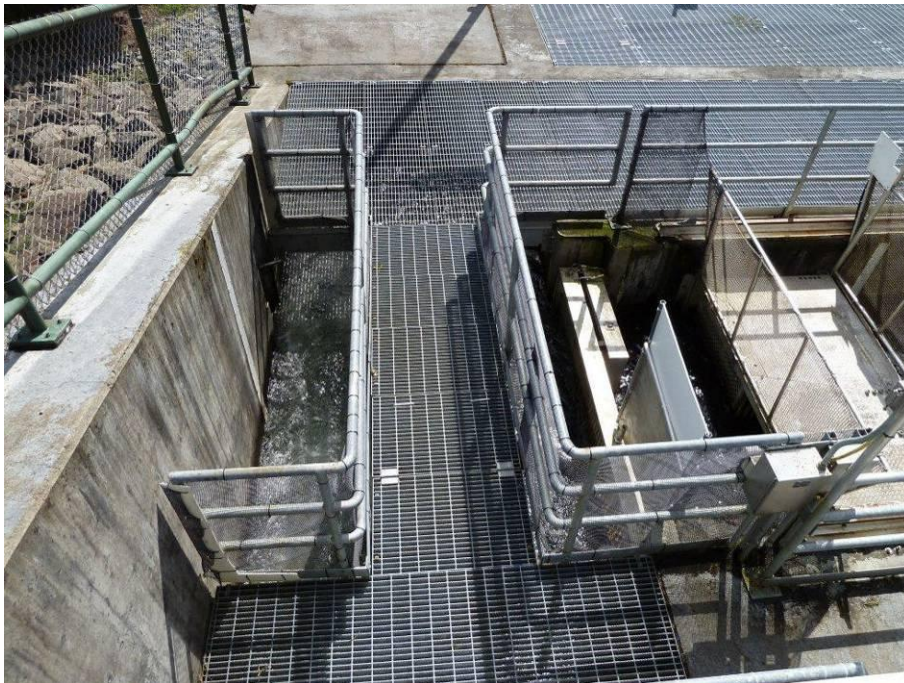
A fish ladder and sorting facility have been installed on the Landsburg Diversion Dam
